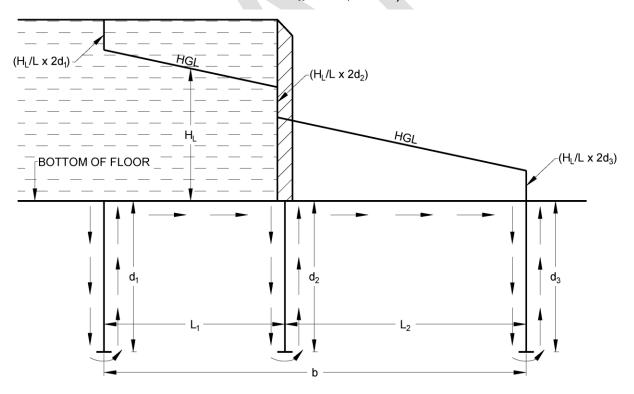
Creep Length (along Arrows) for Hydraulic Structure on Pervious Foundation
